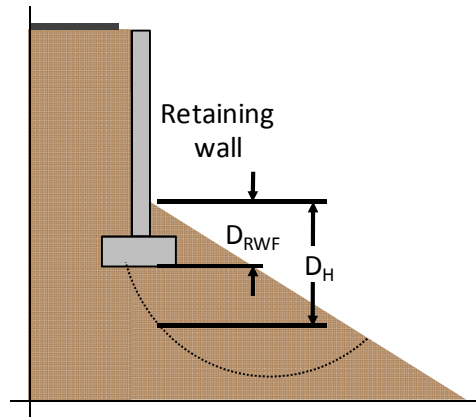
Retaining wall foundation undermined by landslide or flood hazards.
